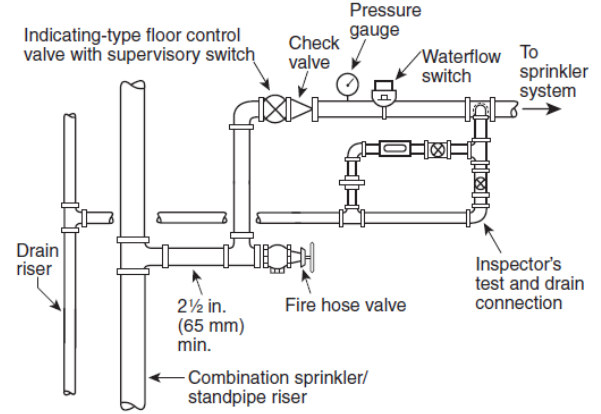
(b) Acceptable Piping Arrangement for Combined Sprinkler/Standpipe System. [14: Figure A.7.10.1.3.1(b)]
